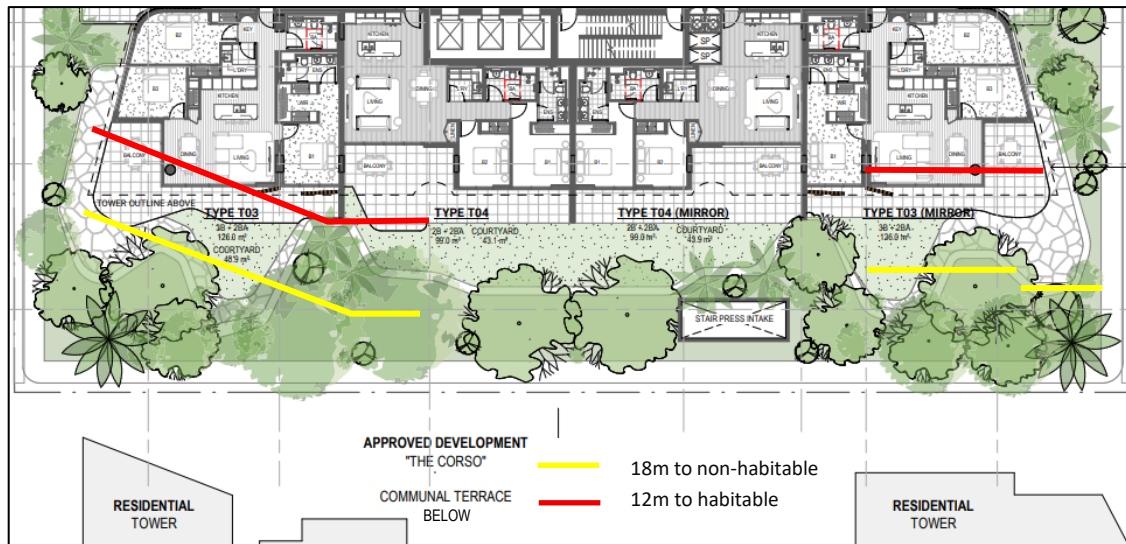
Level 4 Encroachment into Tower Separation Setbacks (Source: Plus Studio 2026)
